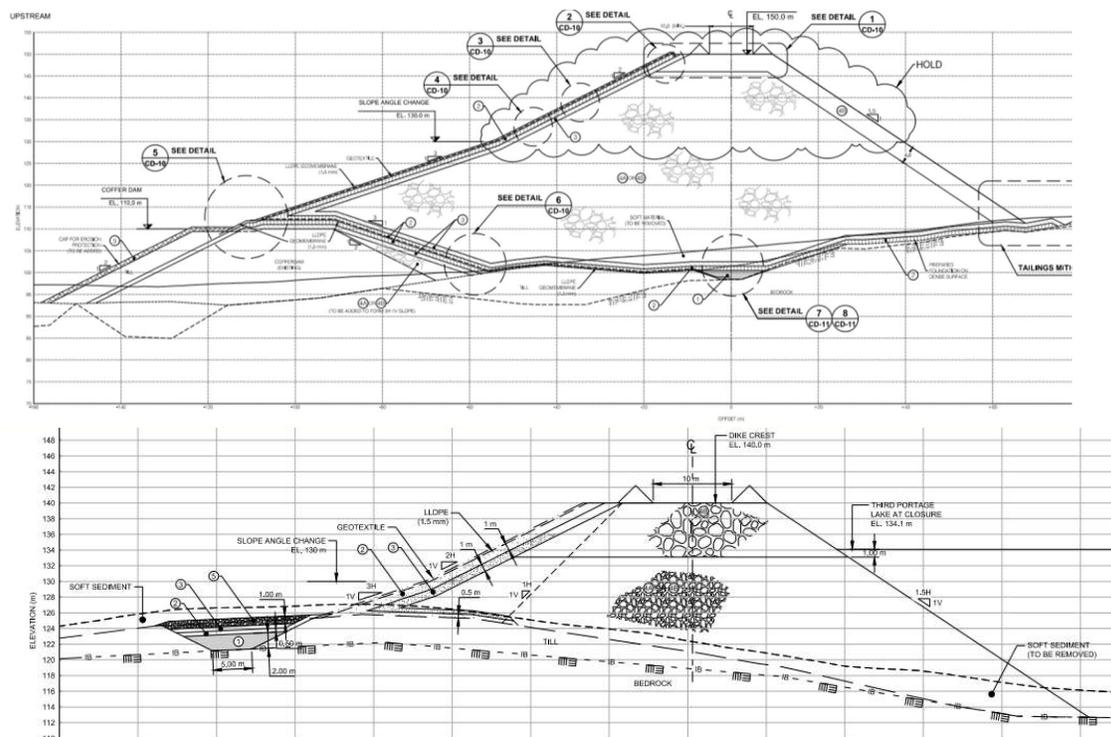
Typical Cross-sections of the Central Dike (top: highest dike section, bottom: section with upstream liner tie-in).
